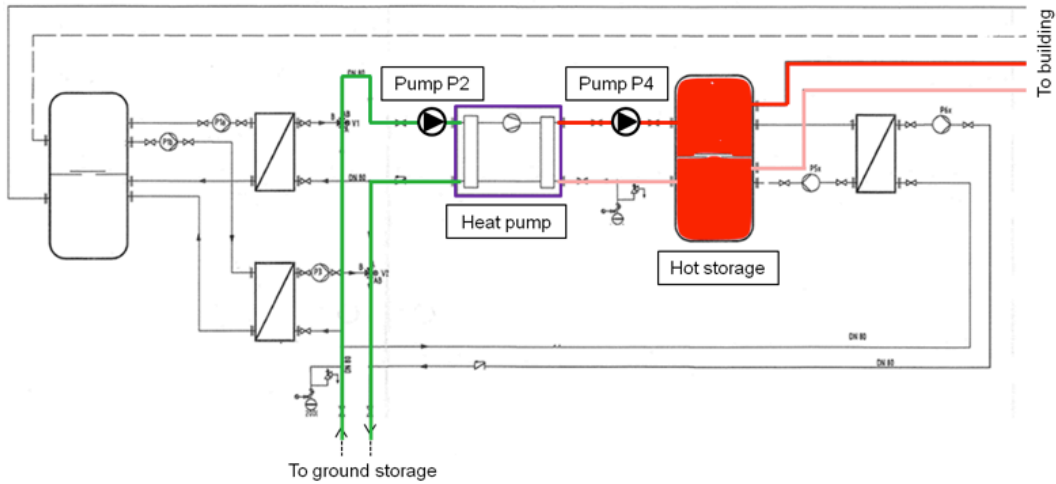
Hydraulic scheme of the heating plant (building C)
